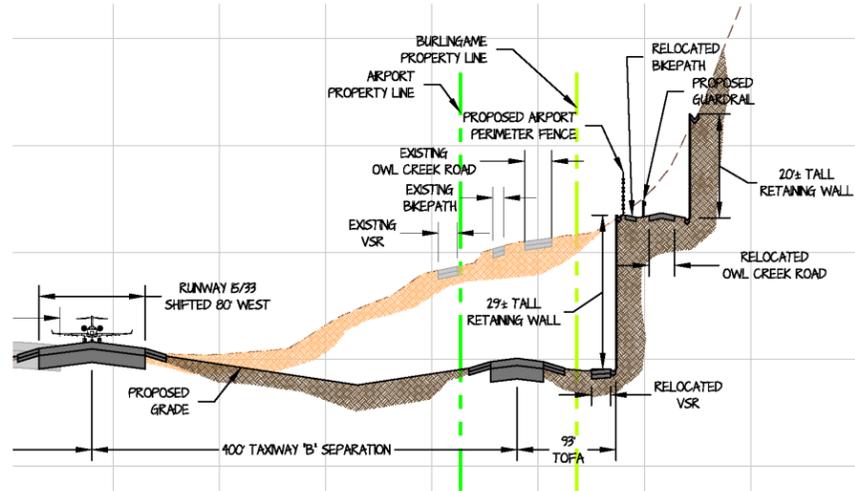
Retaining Wall Height at Owl Creek Road Pinch Point with VSR Inside of TOFA (Appendix C, Alternative 8, Sheet 6 of 7)
